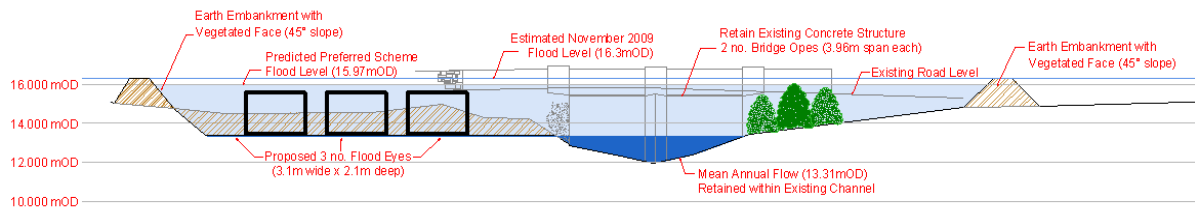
Proposed Works Channel Works from Dunkellin Bridge to Rinn Bridge
